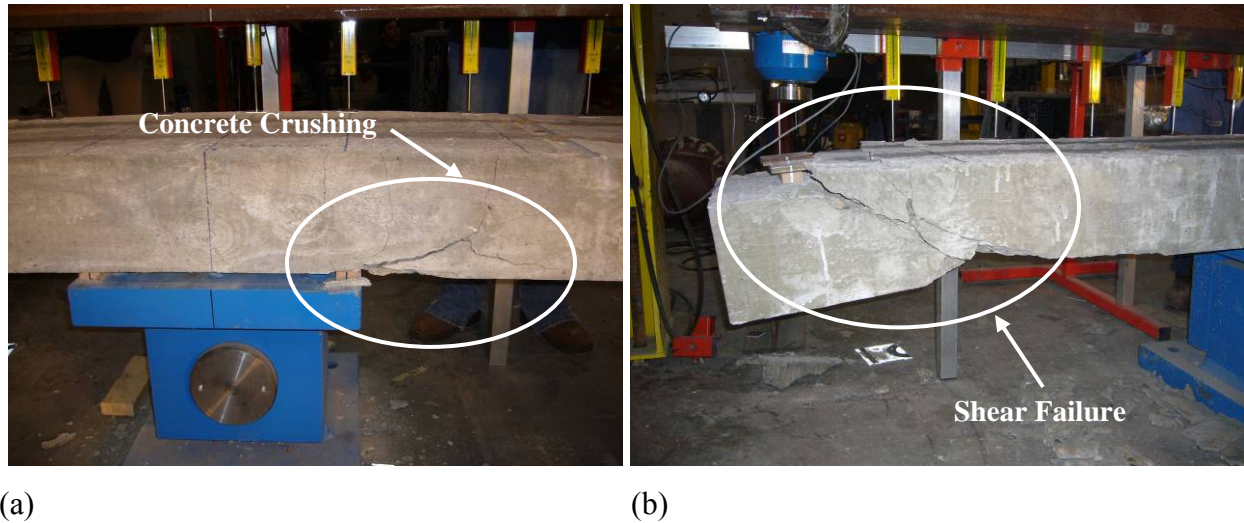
Failure Modes for Epoxy Specimens: (a) Concrete Crushing and (b) Shear.
